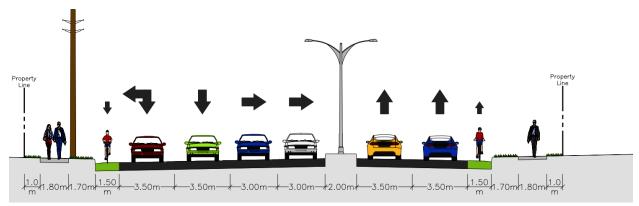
Preferred Design, Hamilton Road Cross-Section, East of Highbury Avenue North
